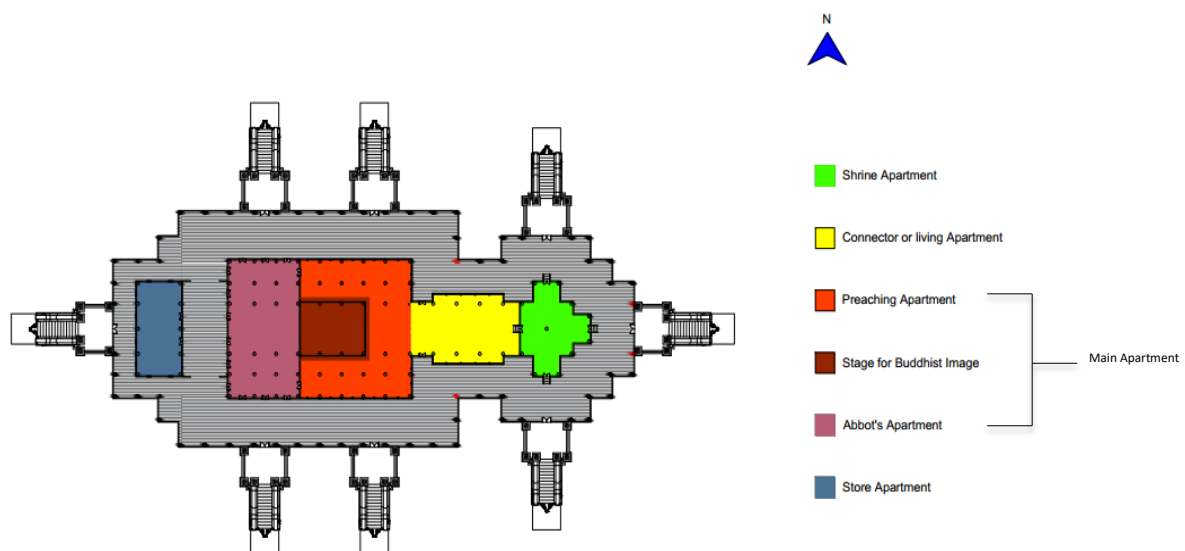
Typical plan of late Koabung wooden monastery. Source: Drawn by author, 2020.
